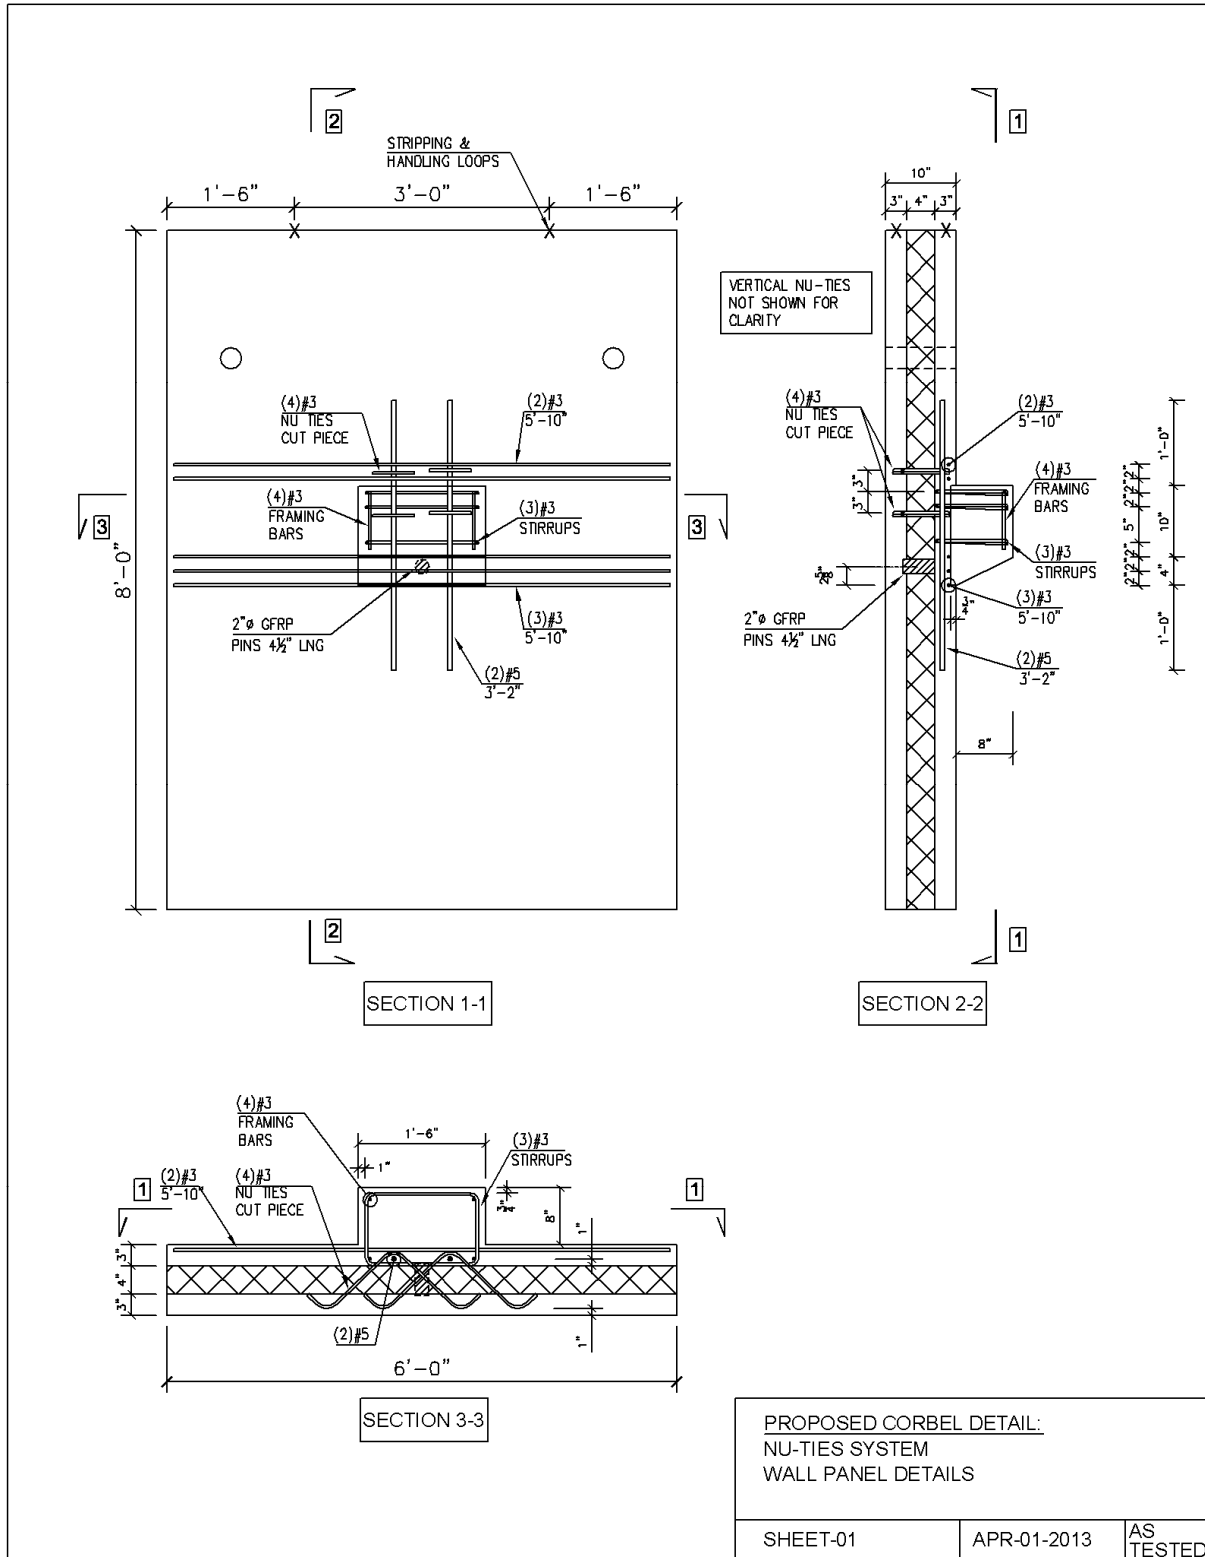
Specimen A3, A4 and A5- Details sheet 1, Unreinforced Wall
